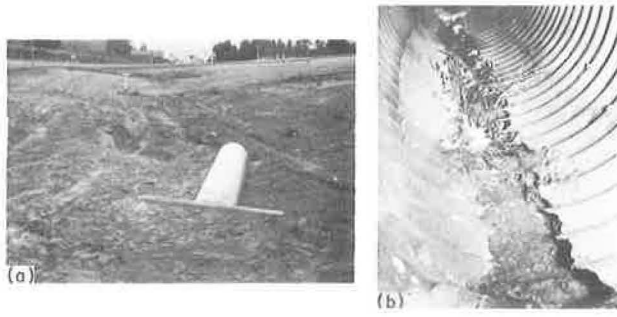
Field test site, IV-SCr-5-A, right of Sta. 530±: (a) aluminum culvert, field test site (exposed pipe subsequently backfilled); (b) existing galvanized C.M.P., approximately 2 yr of service (not placed as part of test program).
